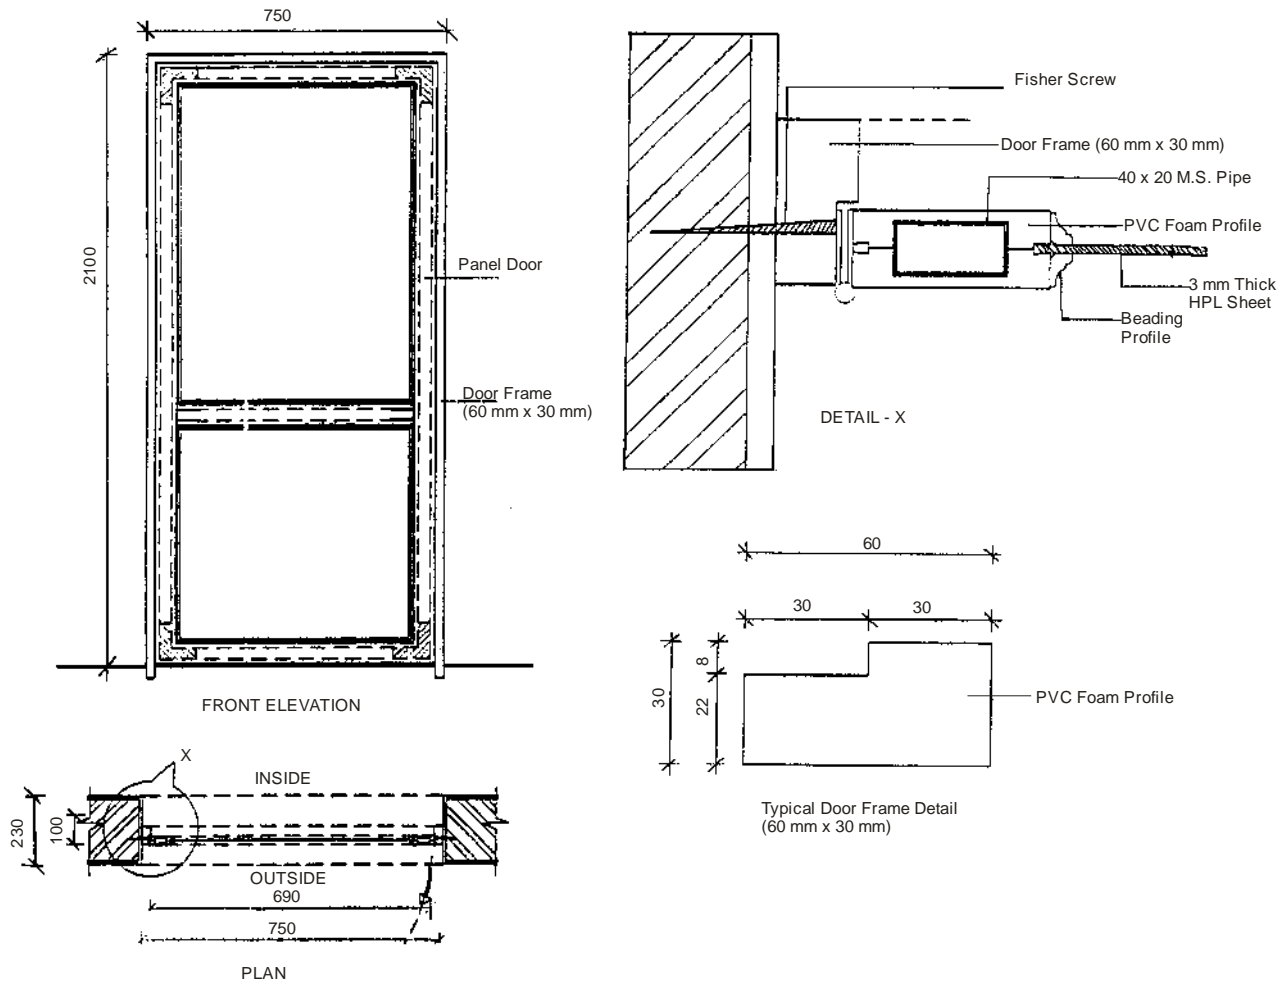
B : Sketch Illustrating Dimensions of Shutter
